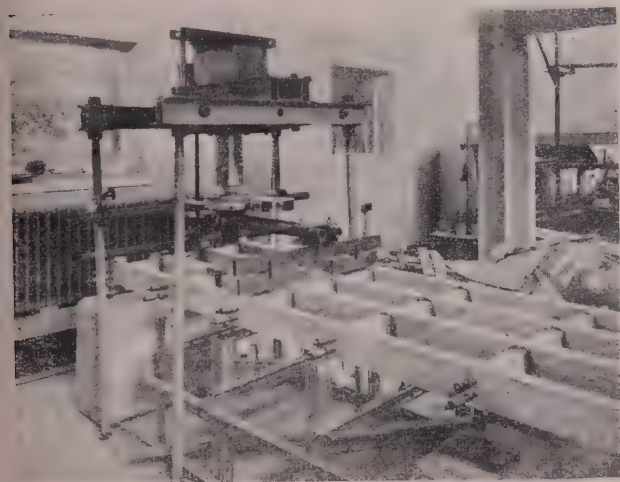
A view of one span of the continuous grillage showing lever loading system
